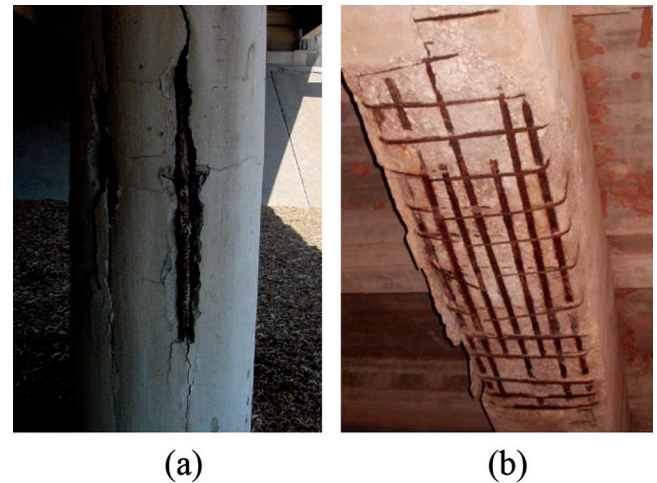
(a) Damaged bridge column and (b) damaged bridge beam as a result of reinforcement corrosion (photos courtesy of D. Trejo).
